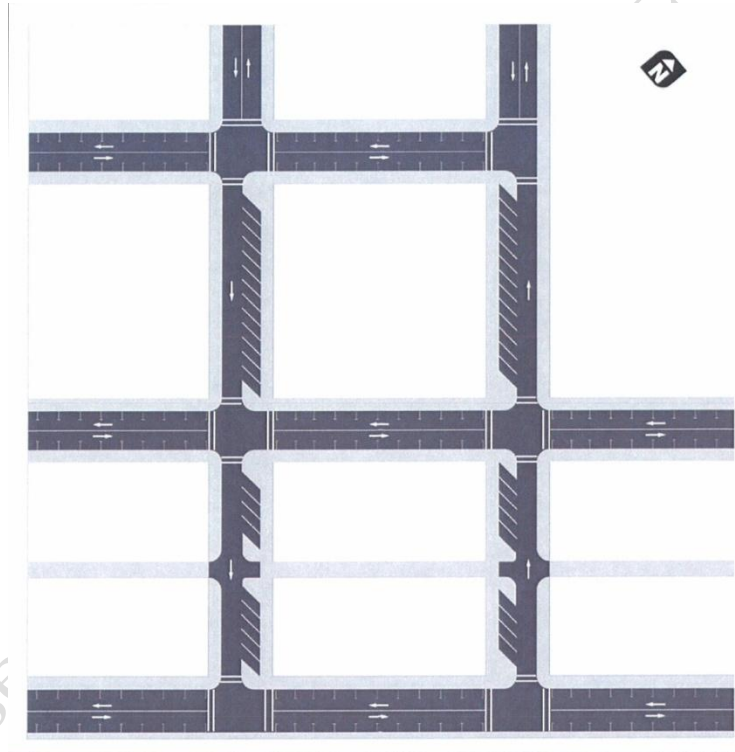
L (Downtown Parking – One Way Angle Parking)
